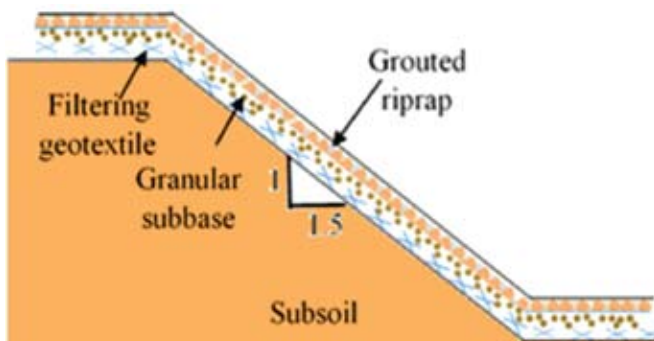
Schematic diagram of a slope with grouted riprap protection
